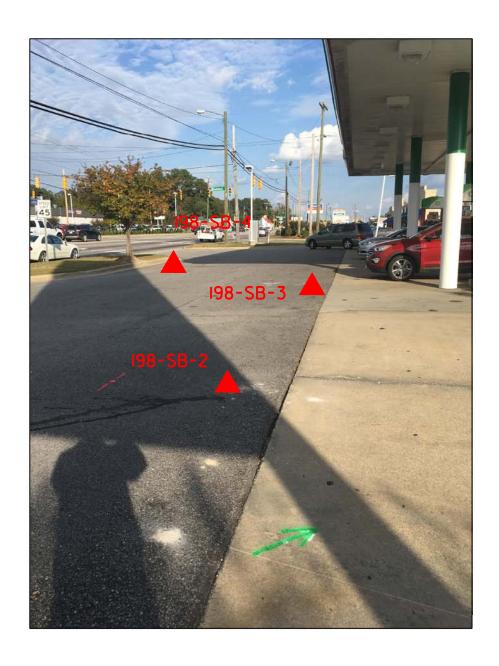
VIEW OF SOIL BORING LOOKING EAST PHOTO 4 - VIEW OF SOIL BORING LOOKING SOUTHEAST
